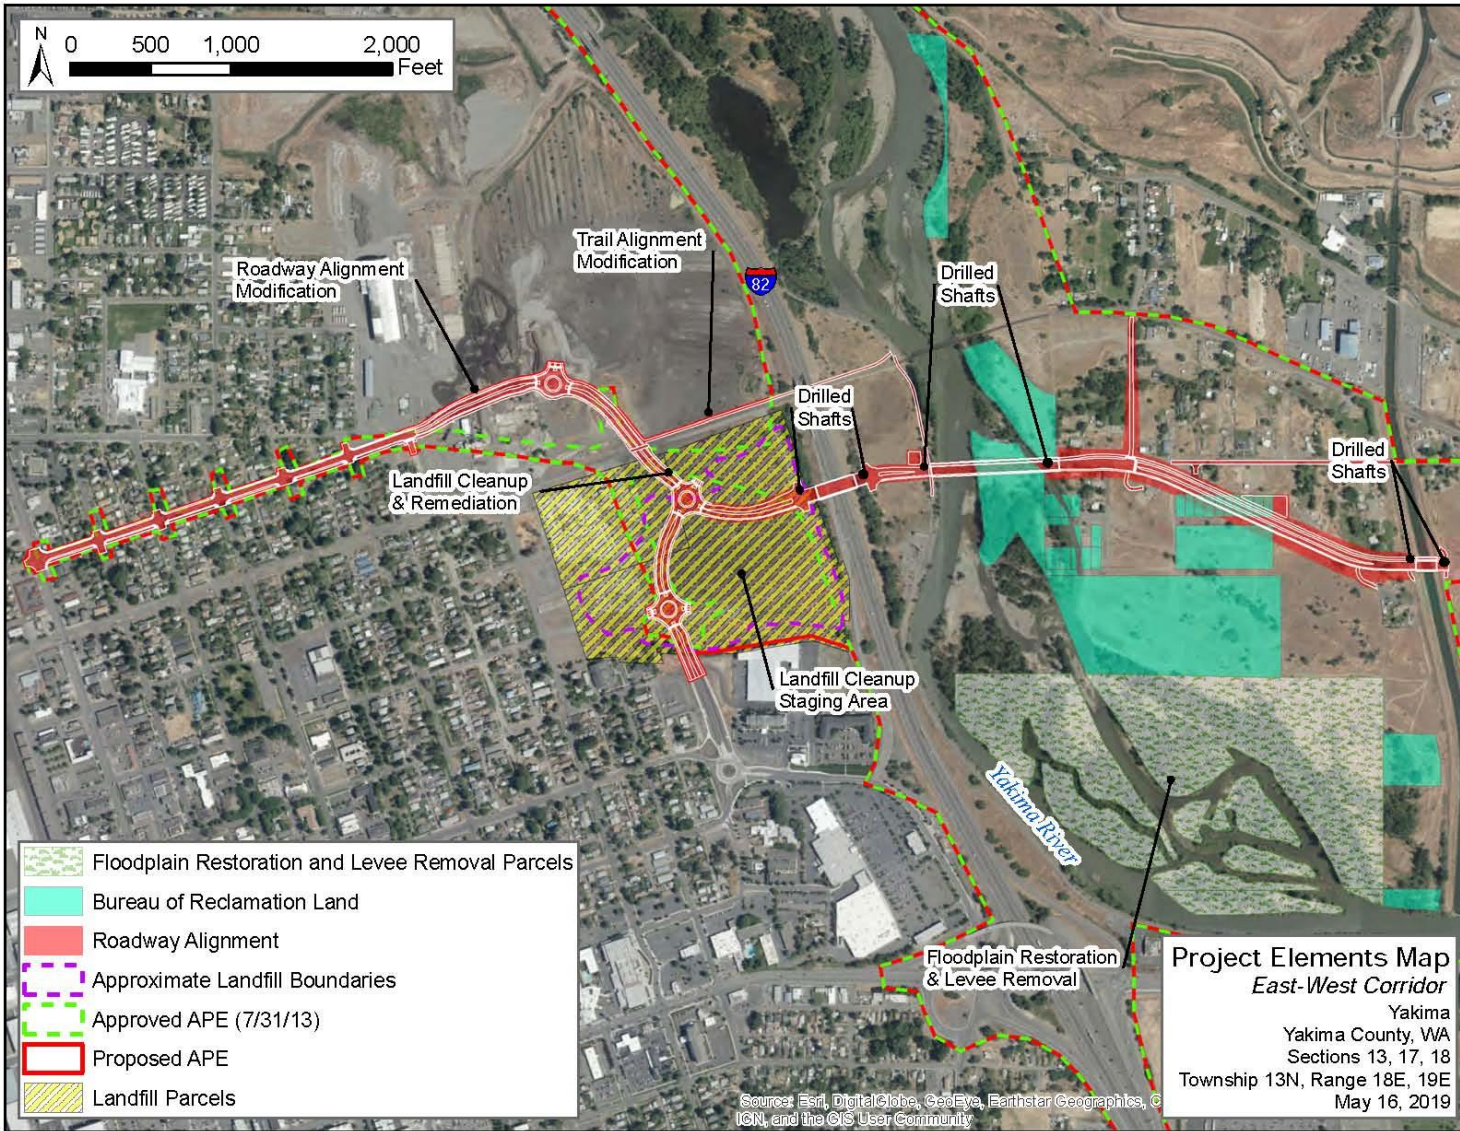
Detail of the proposed footprint of construction for the Yakima East-West Corridor Project (courtesy of Widener and Associates).
